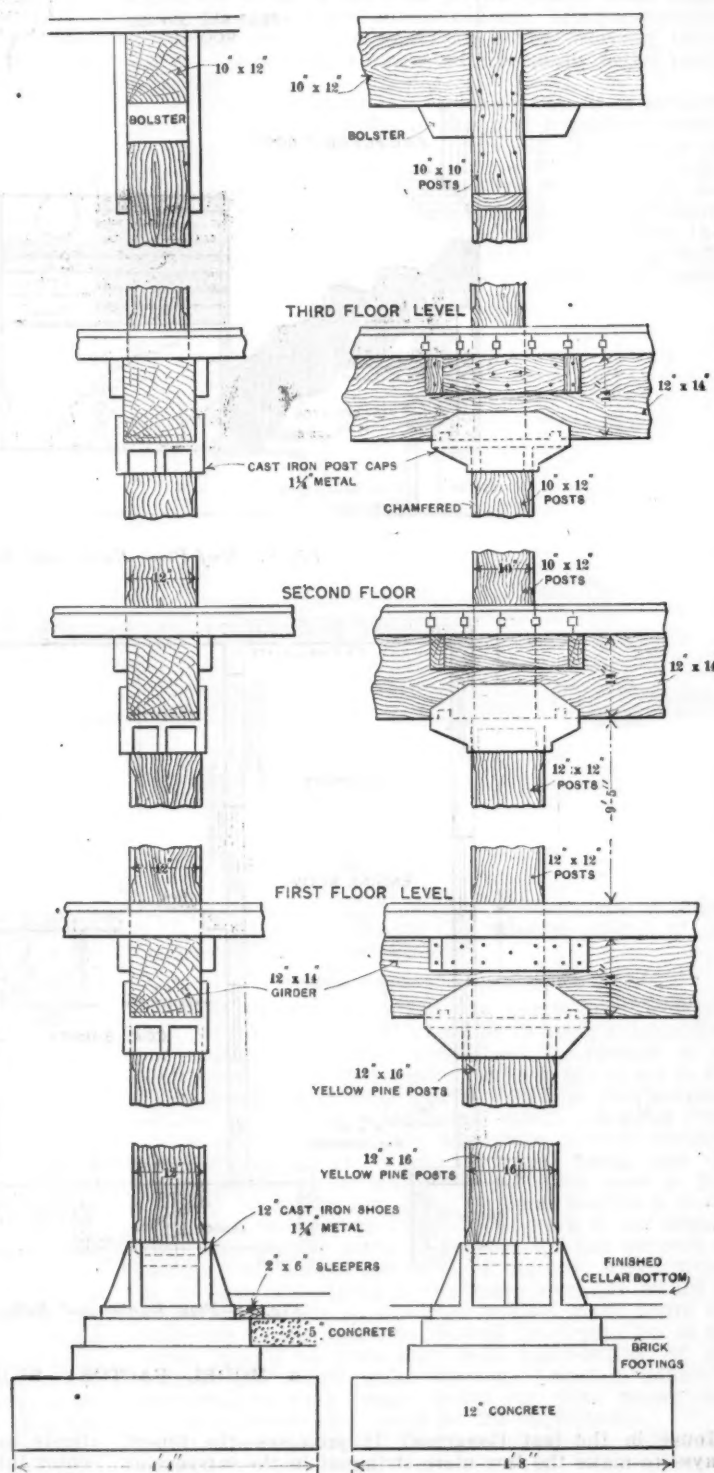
Details of Posts and Floor Beam Connections. Fig. 7.
